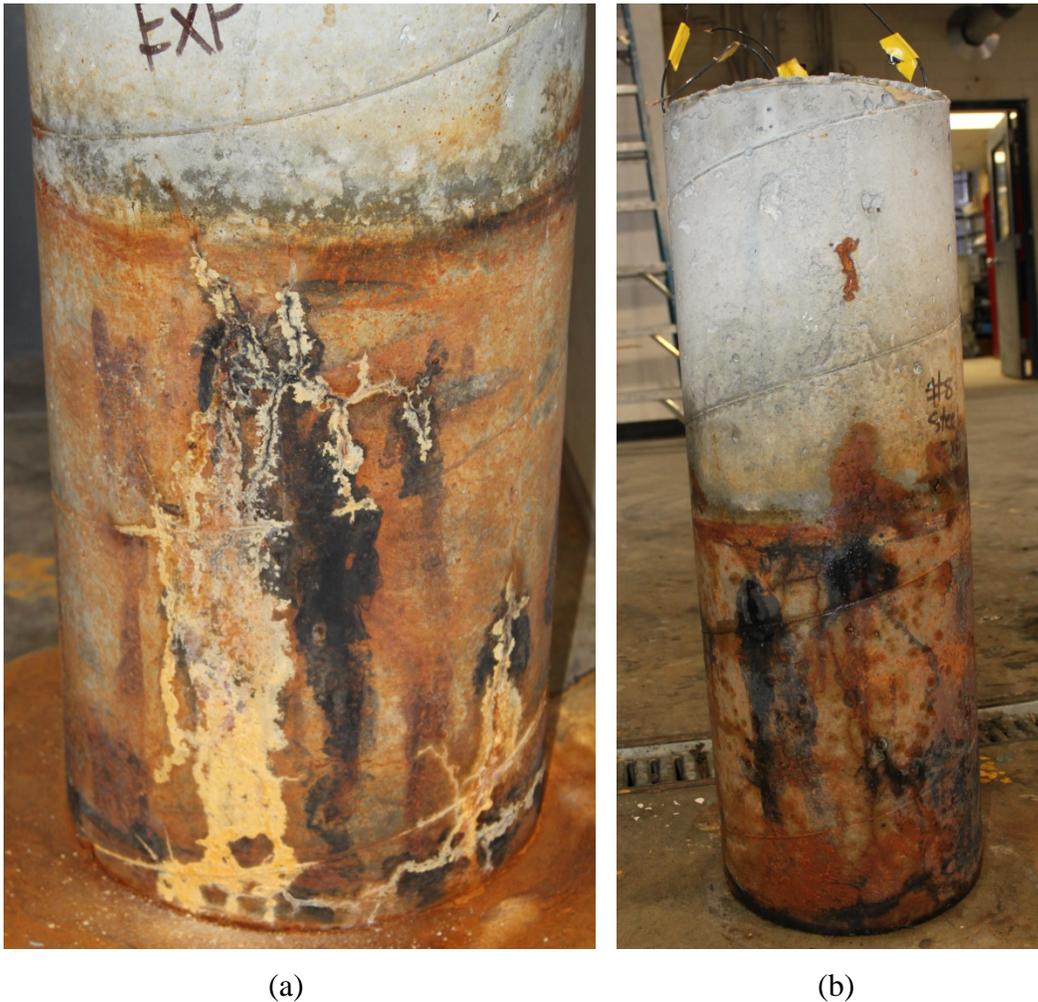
Small-scale column corrosion tests: (a) Column #7; (b) Column #8
